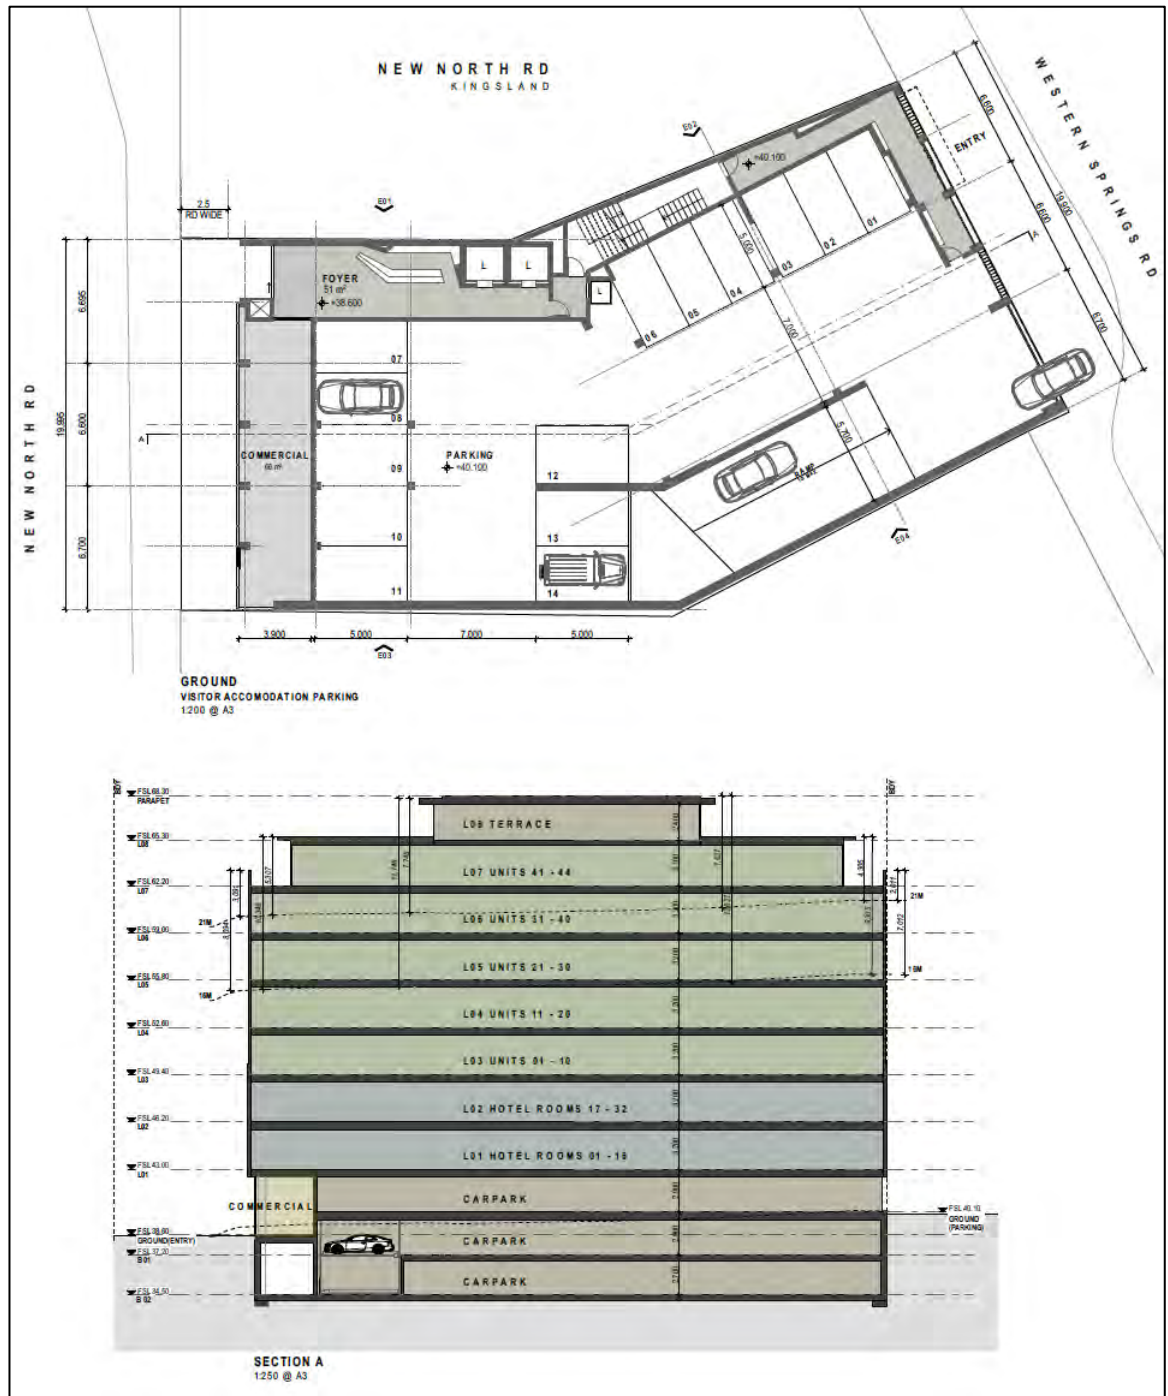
Plan of ground floor of the proposed apartment development (top) and section elevation at bottom. Source: MATZ Architects Ltd.
